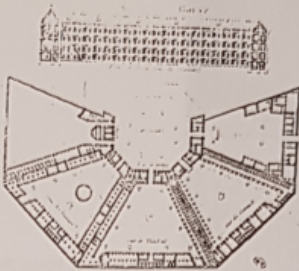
Sketch of ground plan and cross section of Bentham's Panopticon, 1791.
